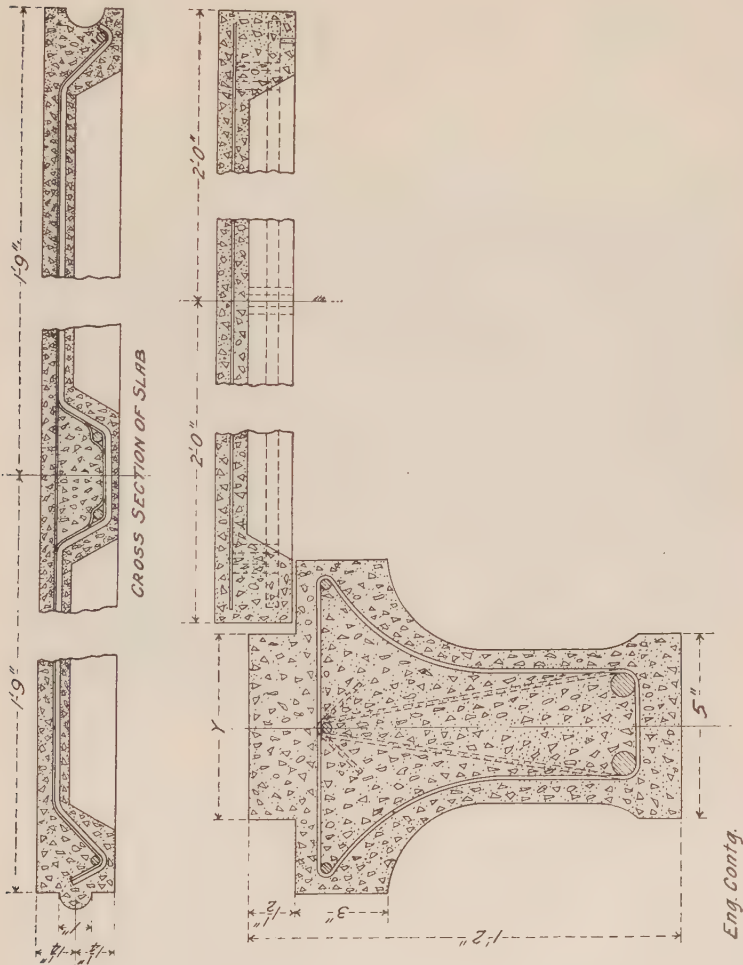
WATSON SYSTEM. BEAM AND SLAB TYPE OF FLOOR.
